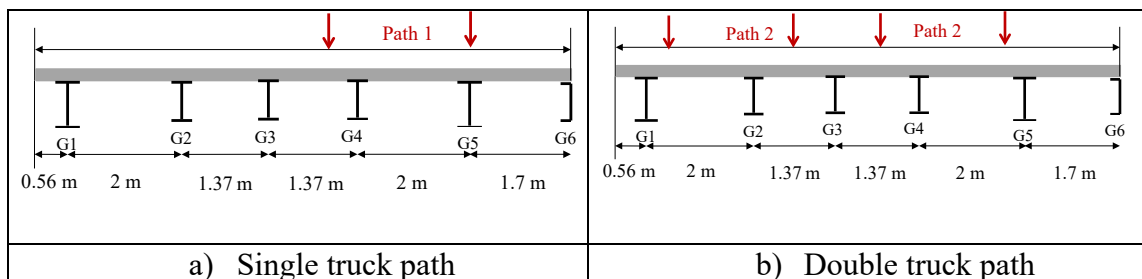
Bridge cross-section and truck path a) single truck path b) double truck path
